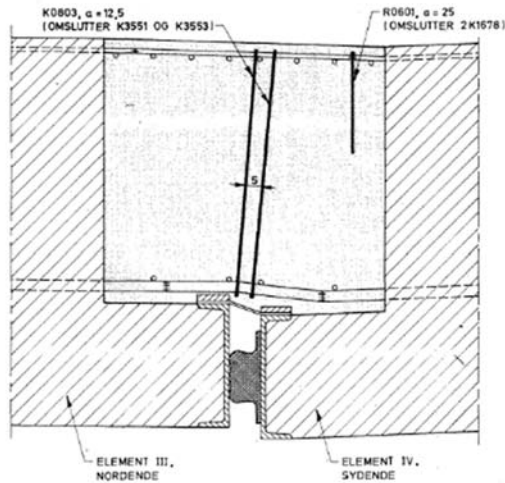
Immersion joint. The joint shown is between elements III and IV where additional reinforcement was installed due to the not perfect alignment.
